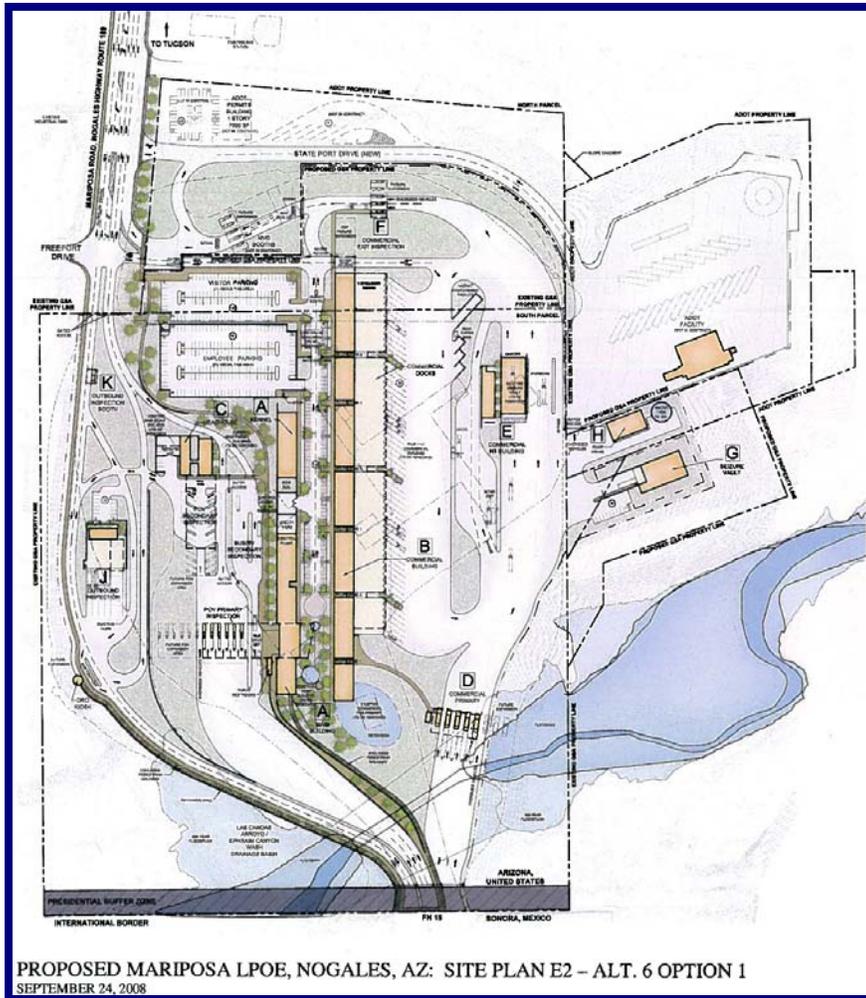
B - Reconfigured Mariposa Port of Entry Funded for Construction
